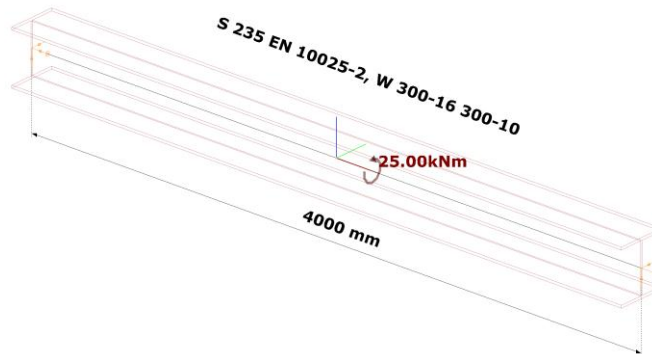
Simple fork supported structural member loaded by concentrated twist moment at the middle cross-section
